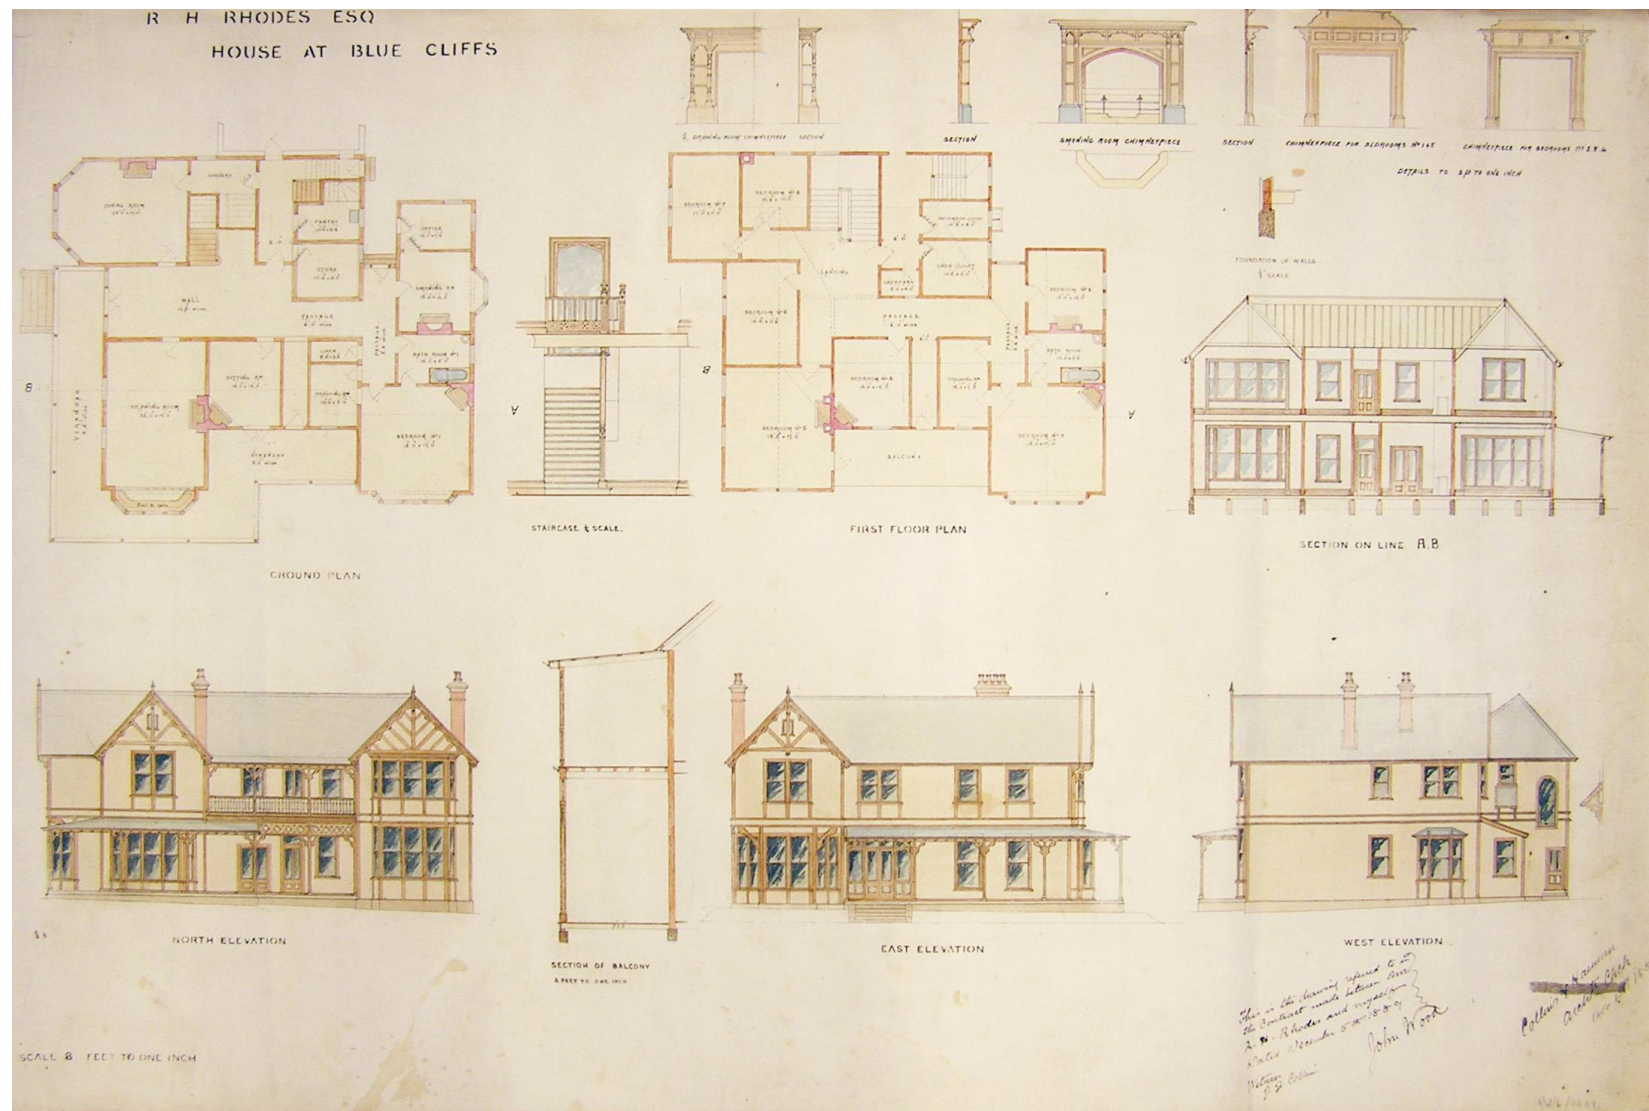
Collins and Harman, R. H. Rhodes, Esq., House at Blue Cliffs, plans, elevations, section and details (1889).
